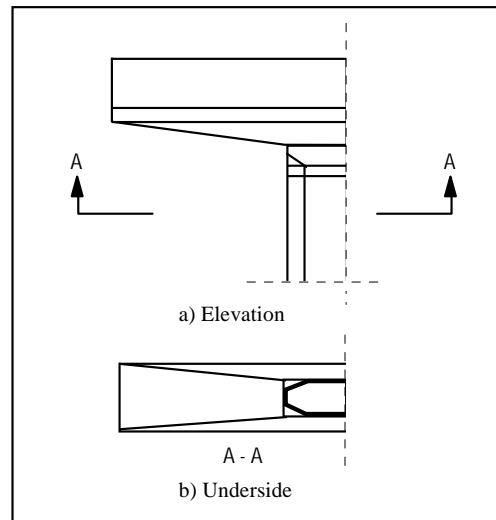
Inverted T cap taper for Proposal I in elevation and plan
